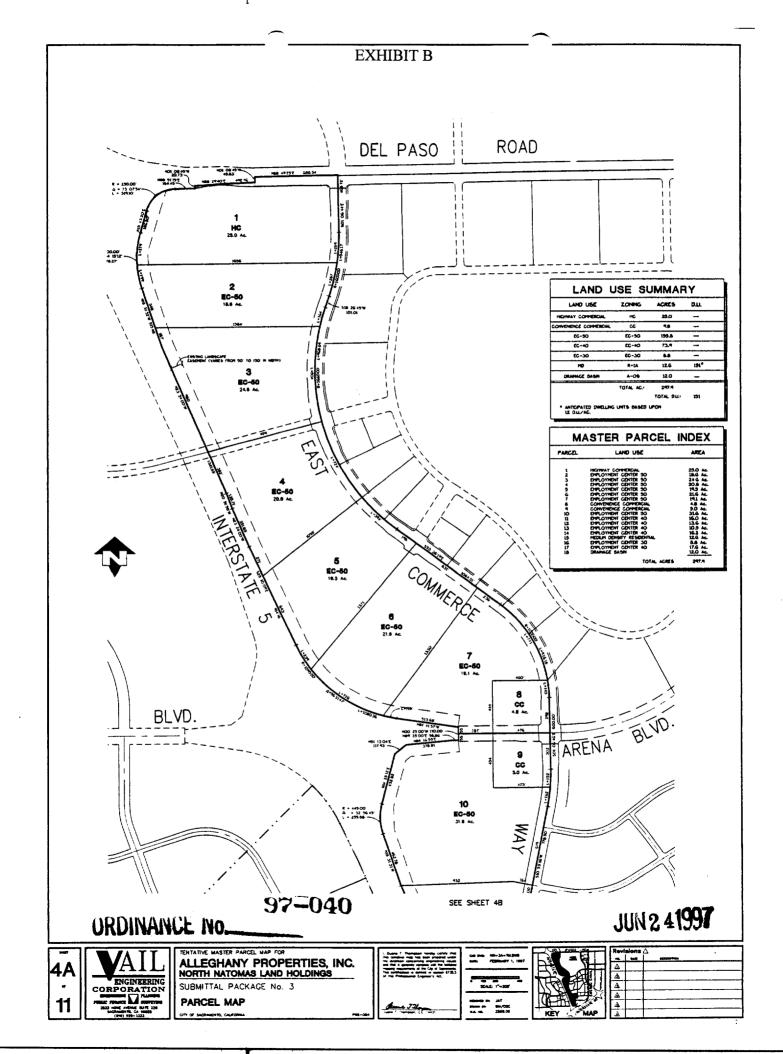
# EXHIBIT B LANDOWNER'S DEVELOPMENT PLAN
